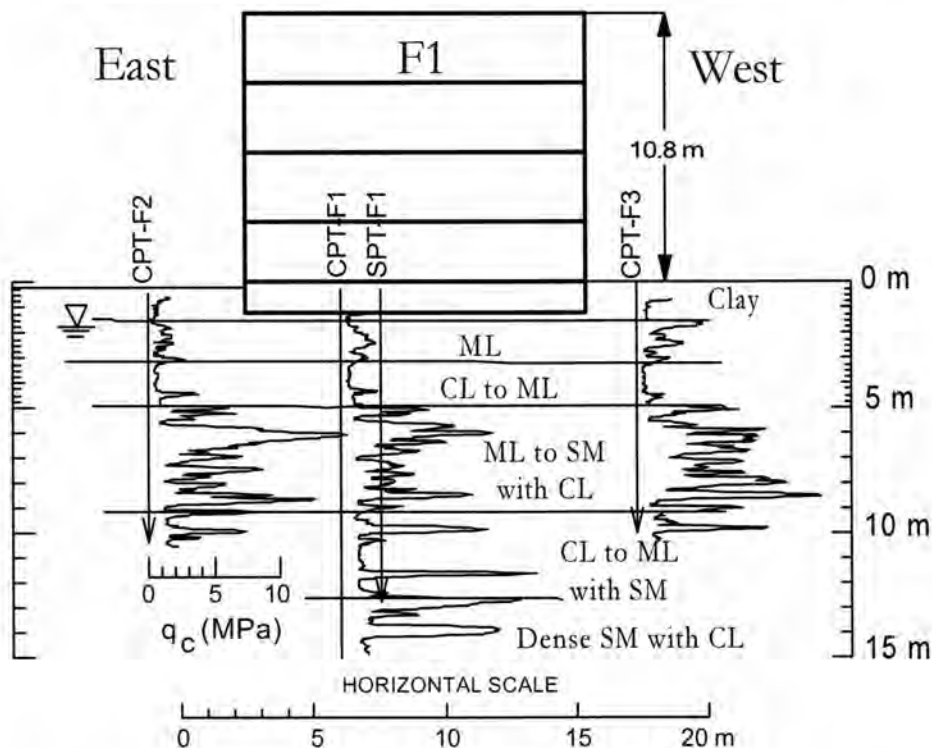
Example of Foundation Soil Conditions for a Four-Story Reinforced Concrete Structure in Adapazari, Turkey (After Bray et al., 2003)
